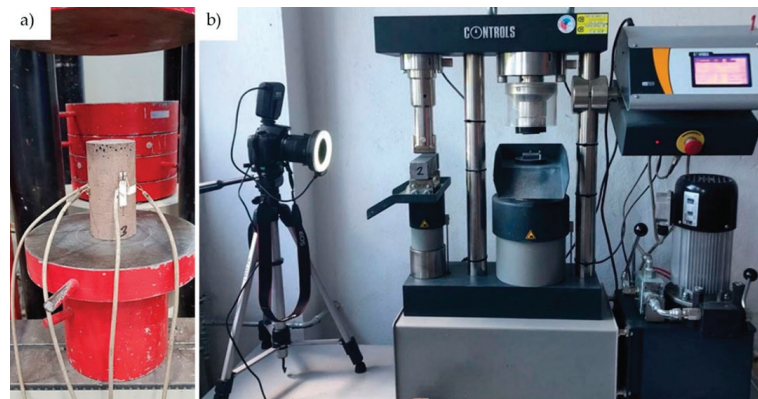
Samples during the test: (a) flexural test of the beam; (b) cylinder compressive test.
